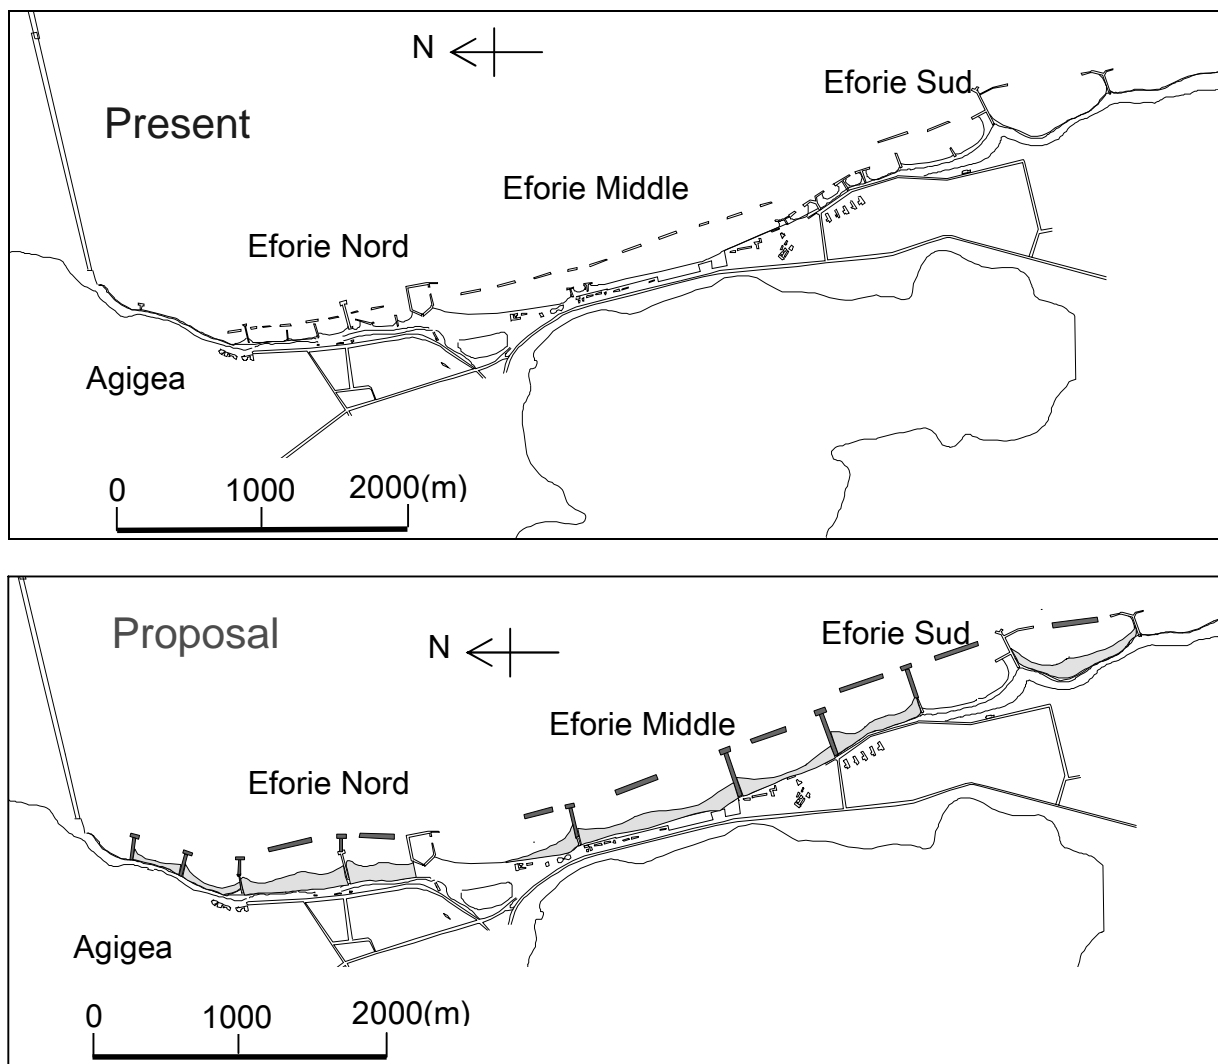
Existing and proposed shore protection facilities at Eforie Sector
